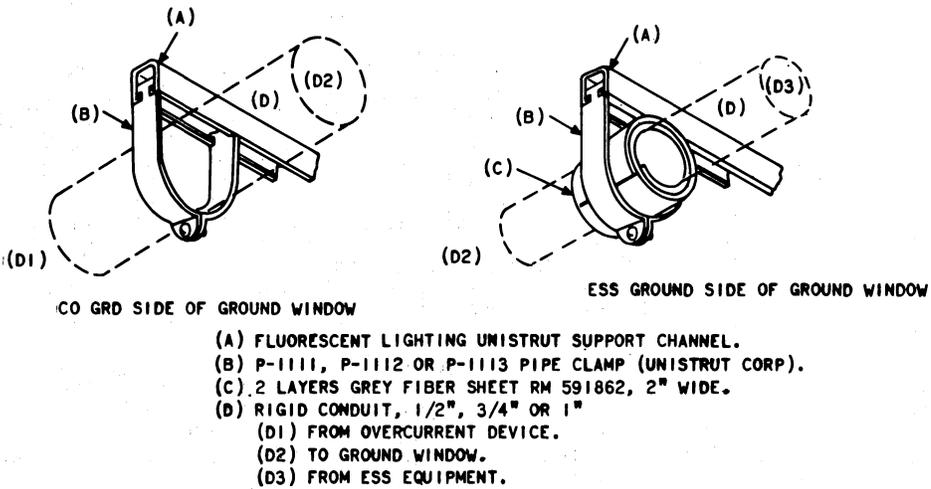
Method of Supporting Conduits Entering ESS Area Through Ground Window From Fluorescent Lighting
